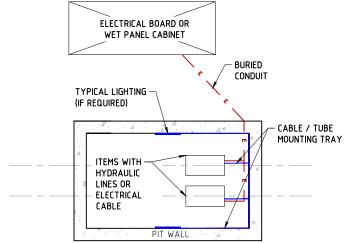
ELECTRICAL OR HYDRAULIC LINE MOUNTING
